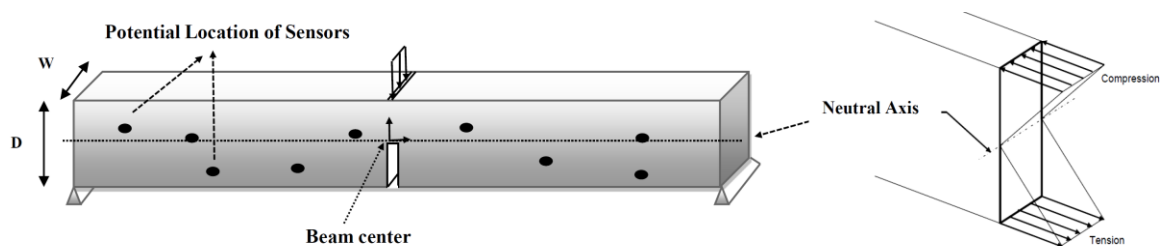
Geometry and loading of a damaged simply supported concrete beam
